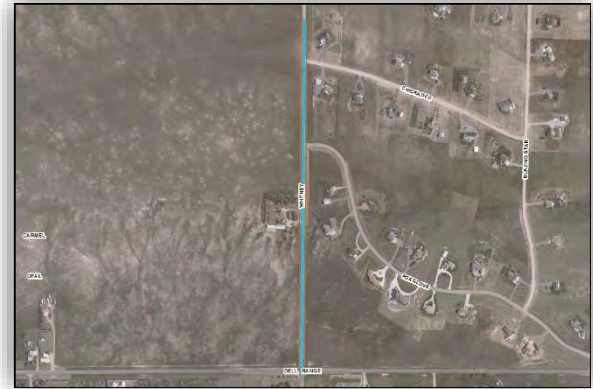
Alternative 3: Existing Alignment with Accessible Profile
